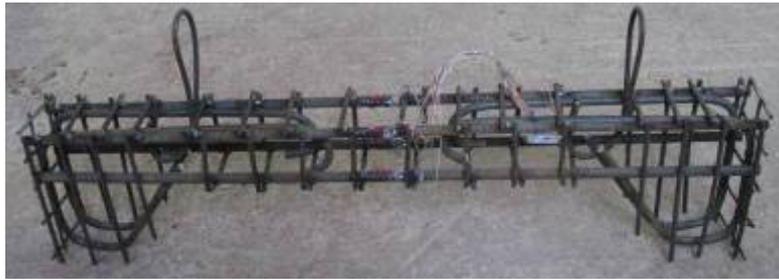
Spatial reinforcing cage for reinforced concrete columns
